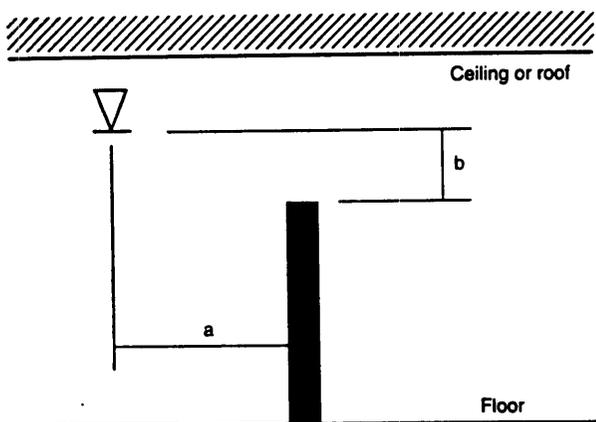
Suspended or floor-mounted obstructions (SSU/SSP).
